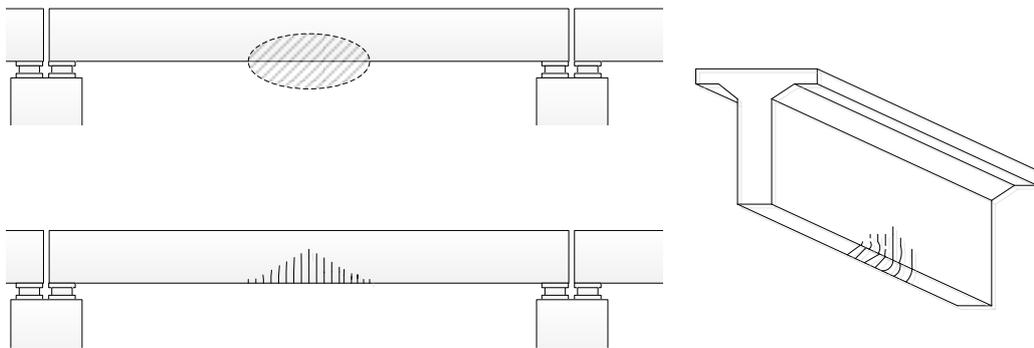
Flexural Cracking at Midspan of Girder
